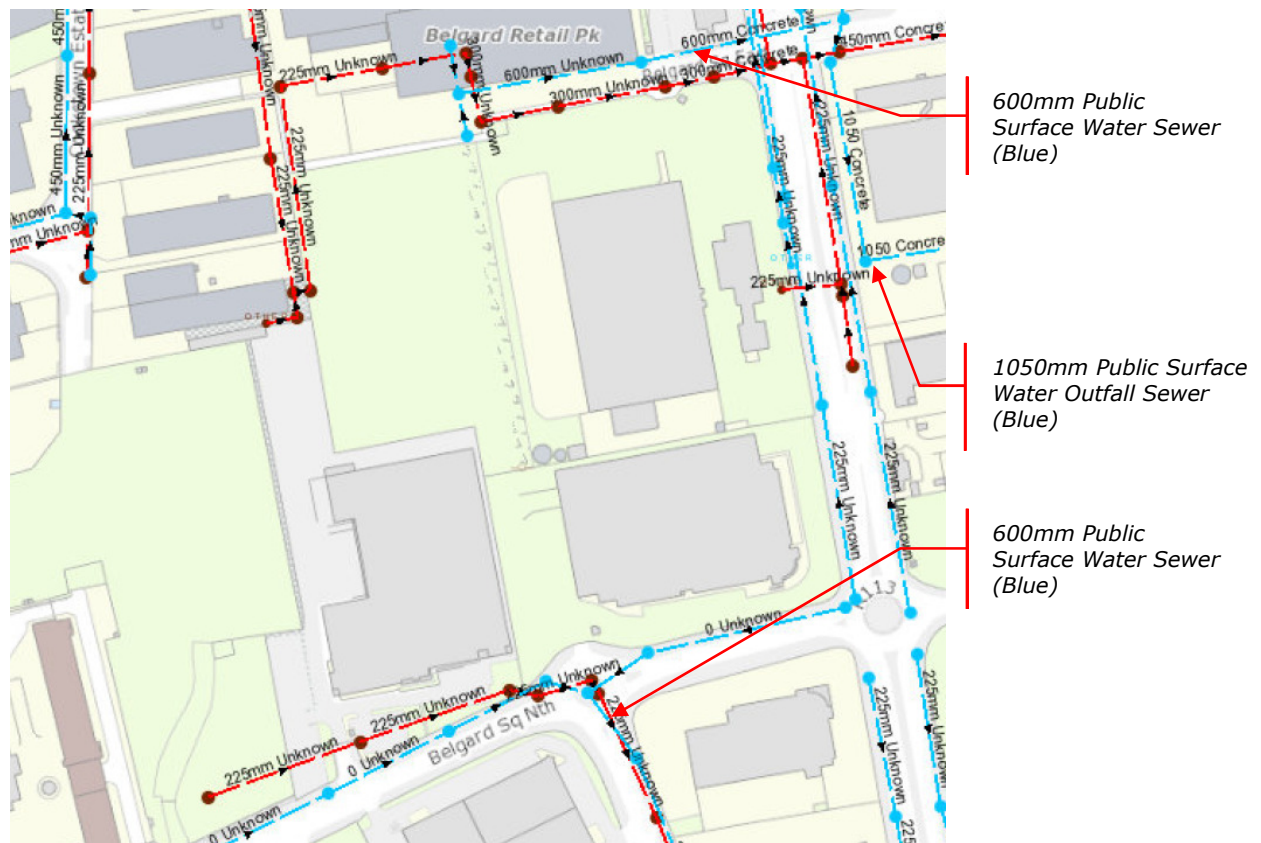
Existing Surface Water Drainage Infrastructure
